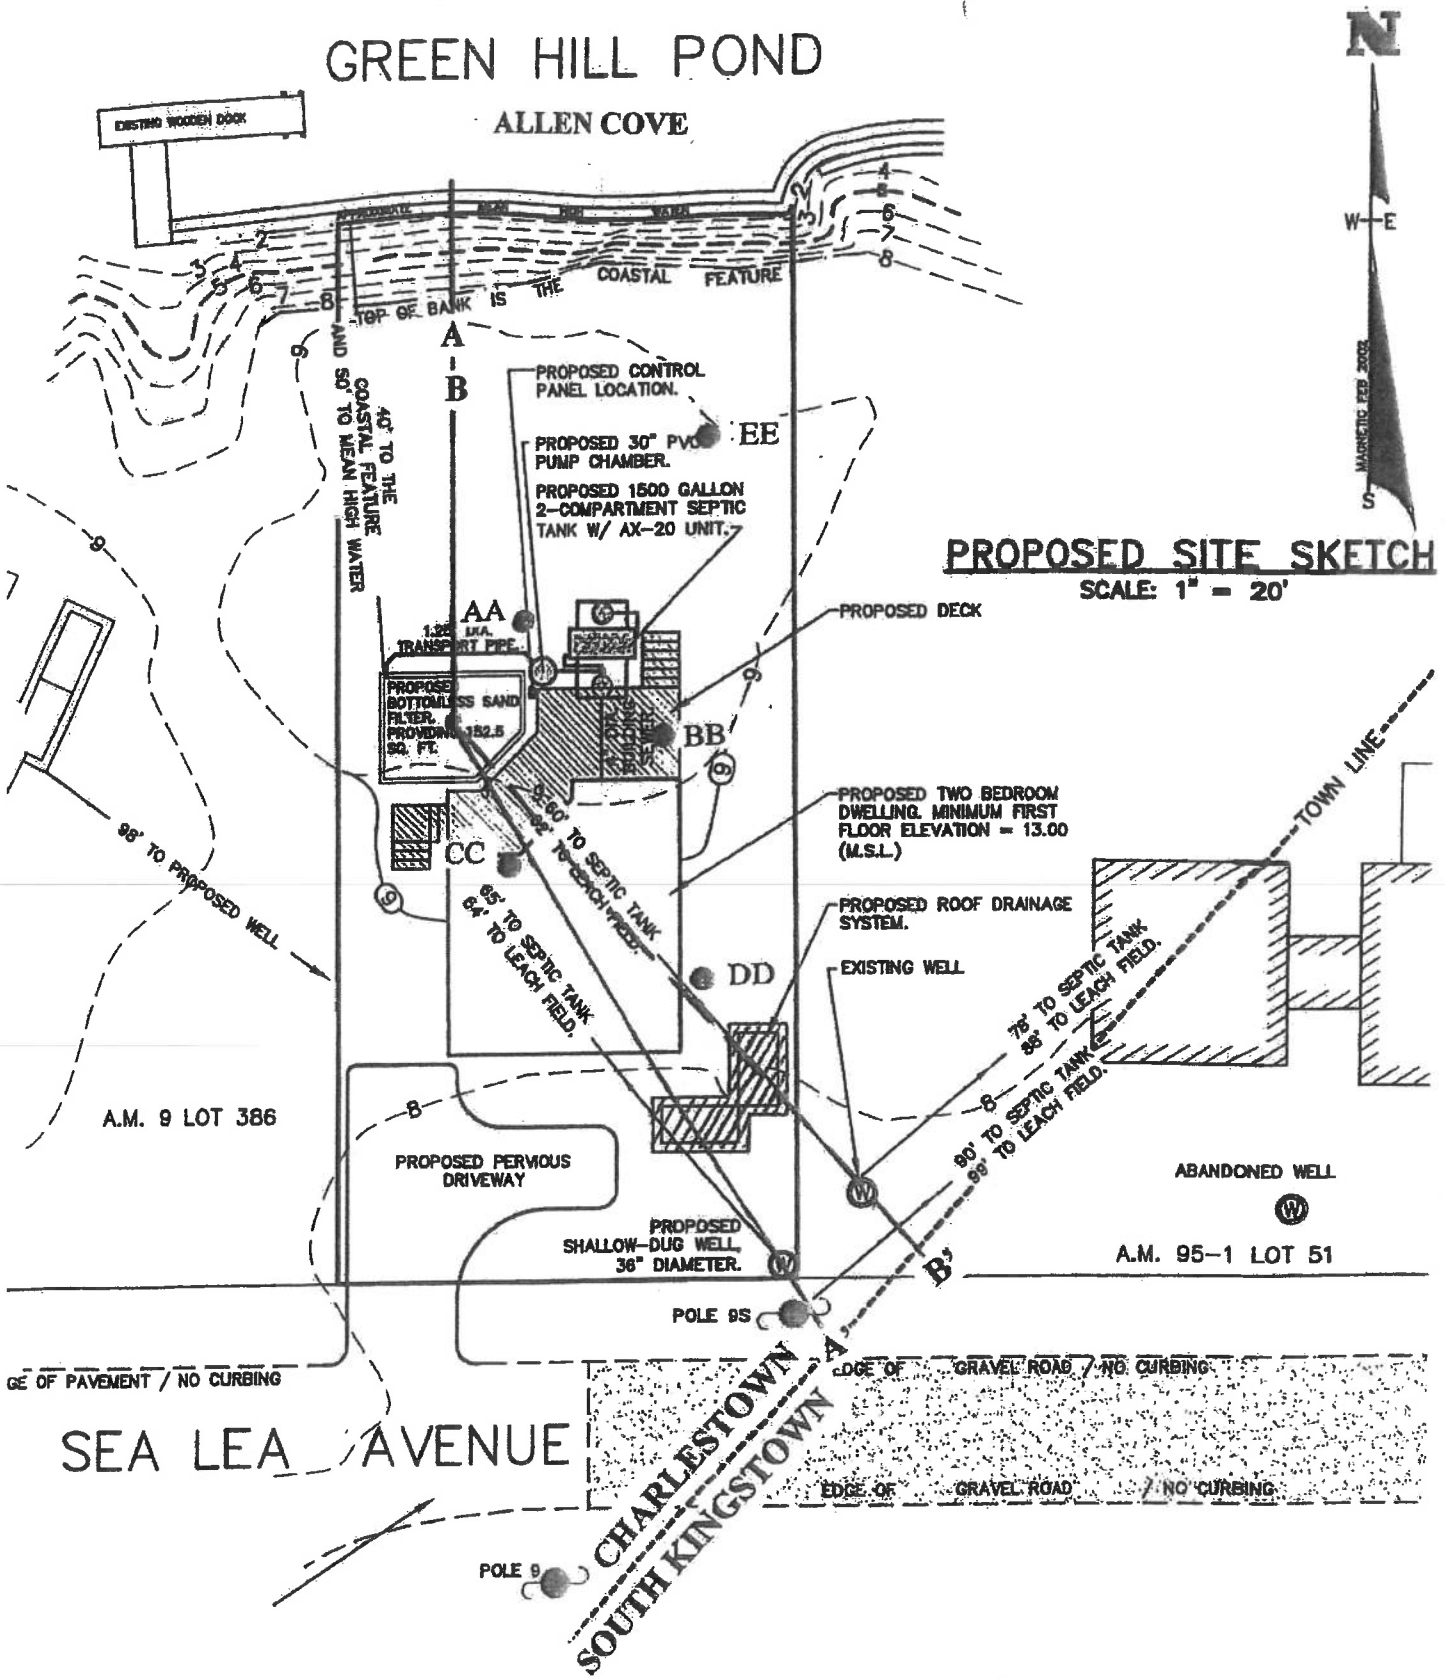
Development Plan for Lot 387 with Cross-Section Locations.
